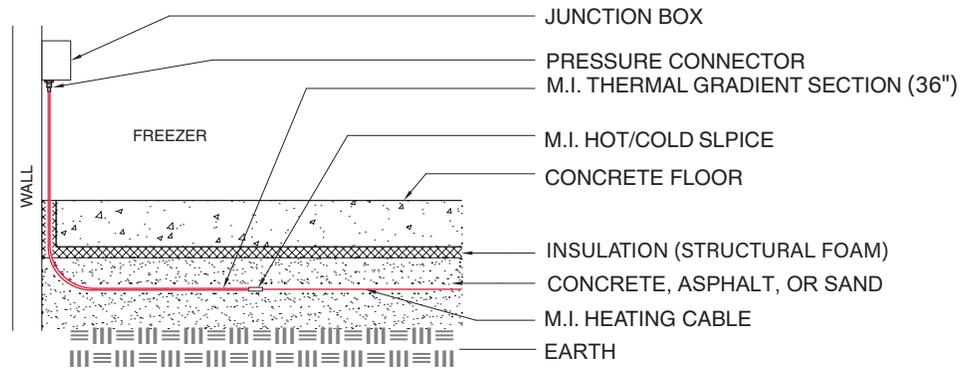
Side view of Installing conductor M.I. cable in subgrade below thermal insulation. M.I. cable is attached to a conduit system and conduit is attached to junction box.
